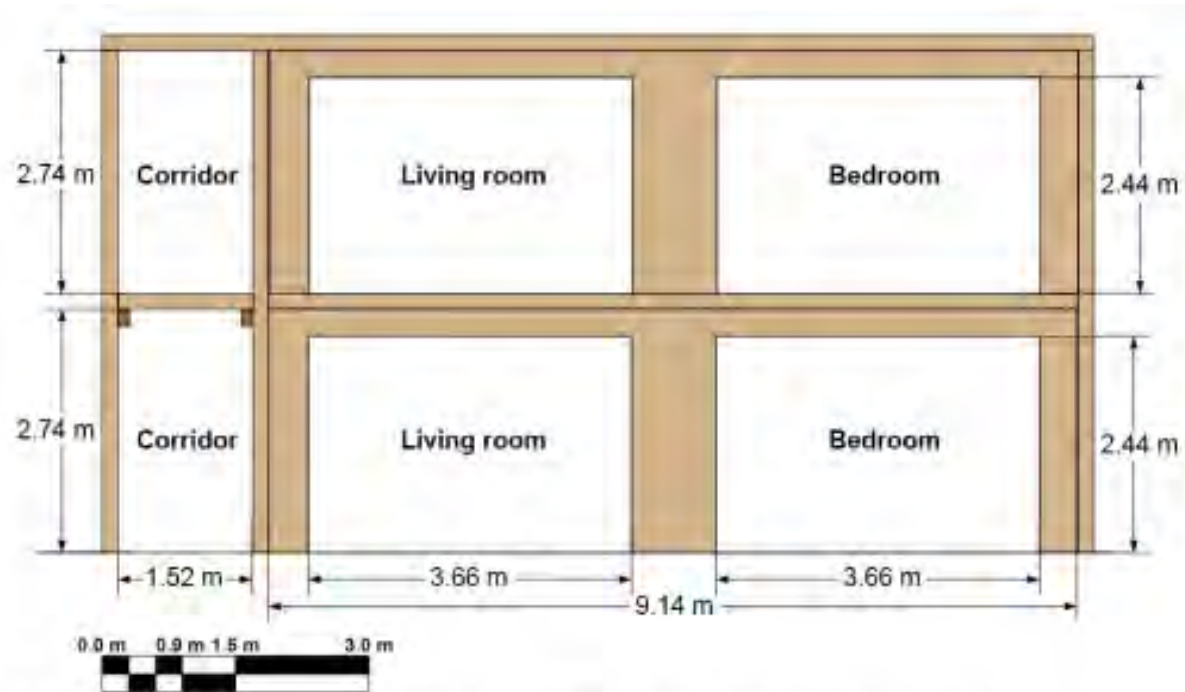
Elevation view of the front of the cross-laminated timber test structure.
